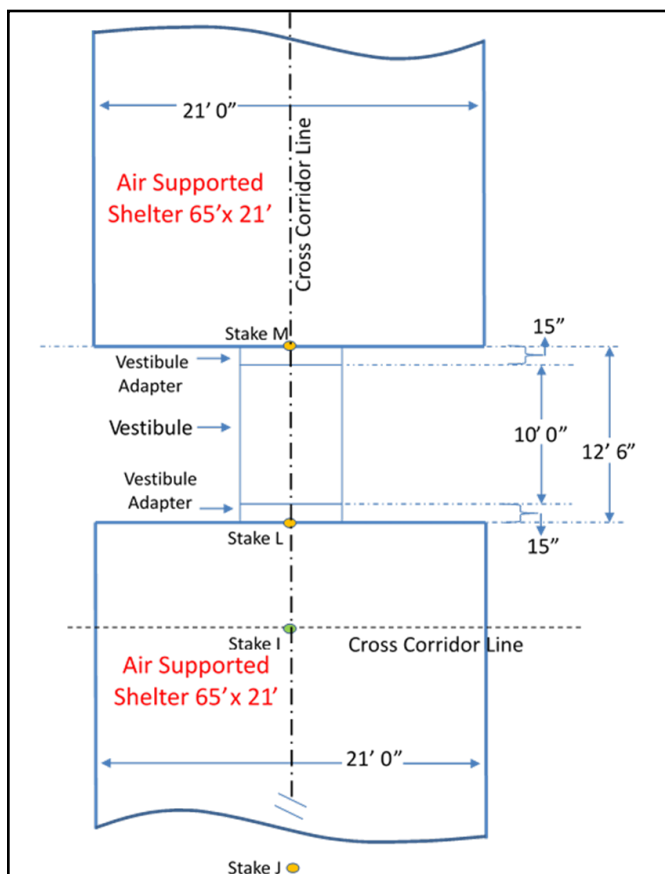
Air Supported Shelter 65 Ft. by 21 ft. Side door panel to Air Supported Shelter 65 ft. by 21 ft. side door panel
